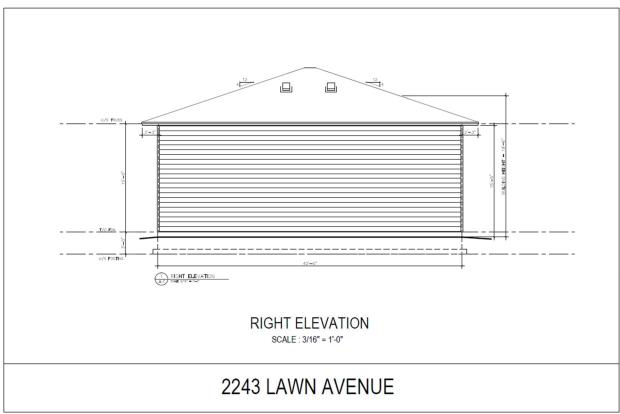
Proposed Elevations of 2243 Lawn Avenue Garage
